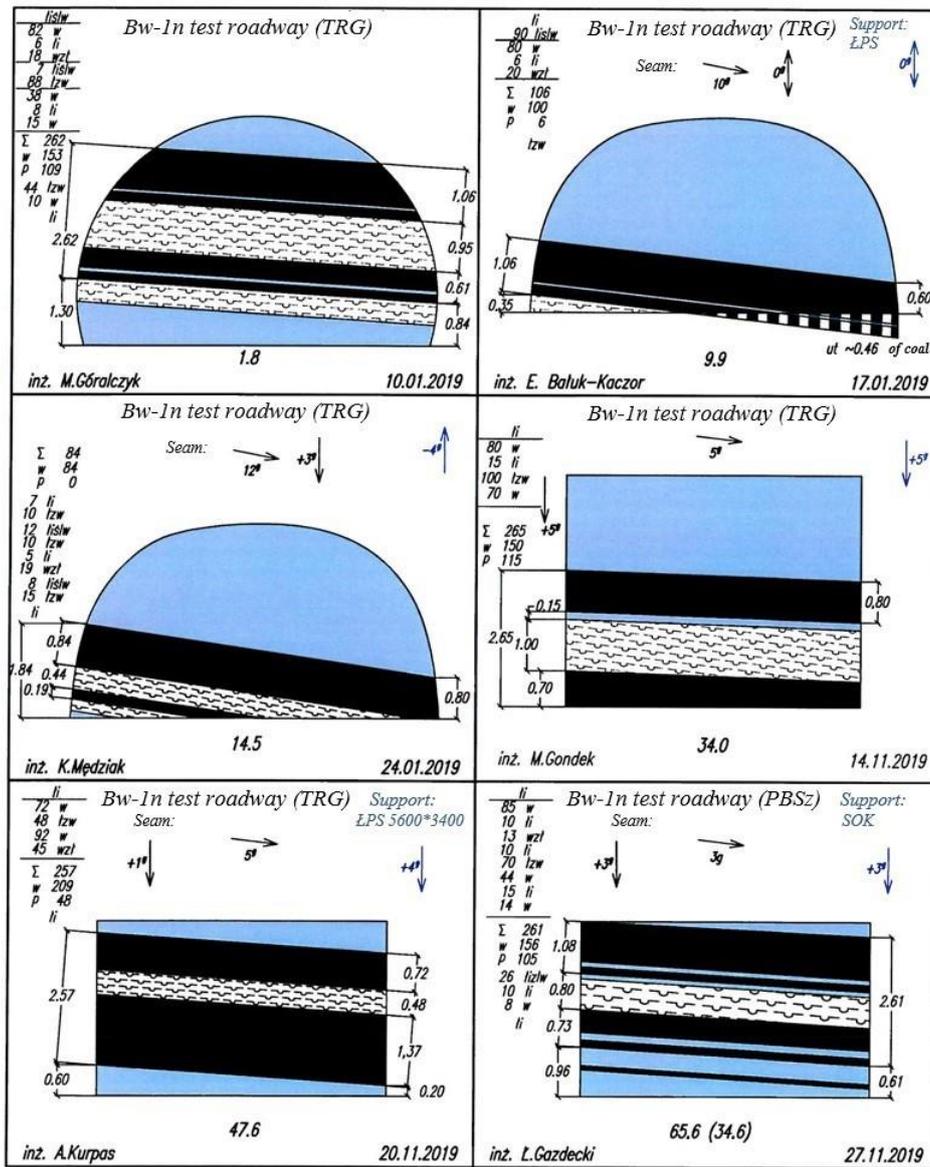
Geological cross-sections of the face 10.01.2019 – 27.11.2019 [135]
